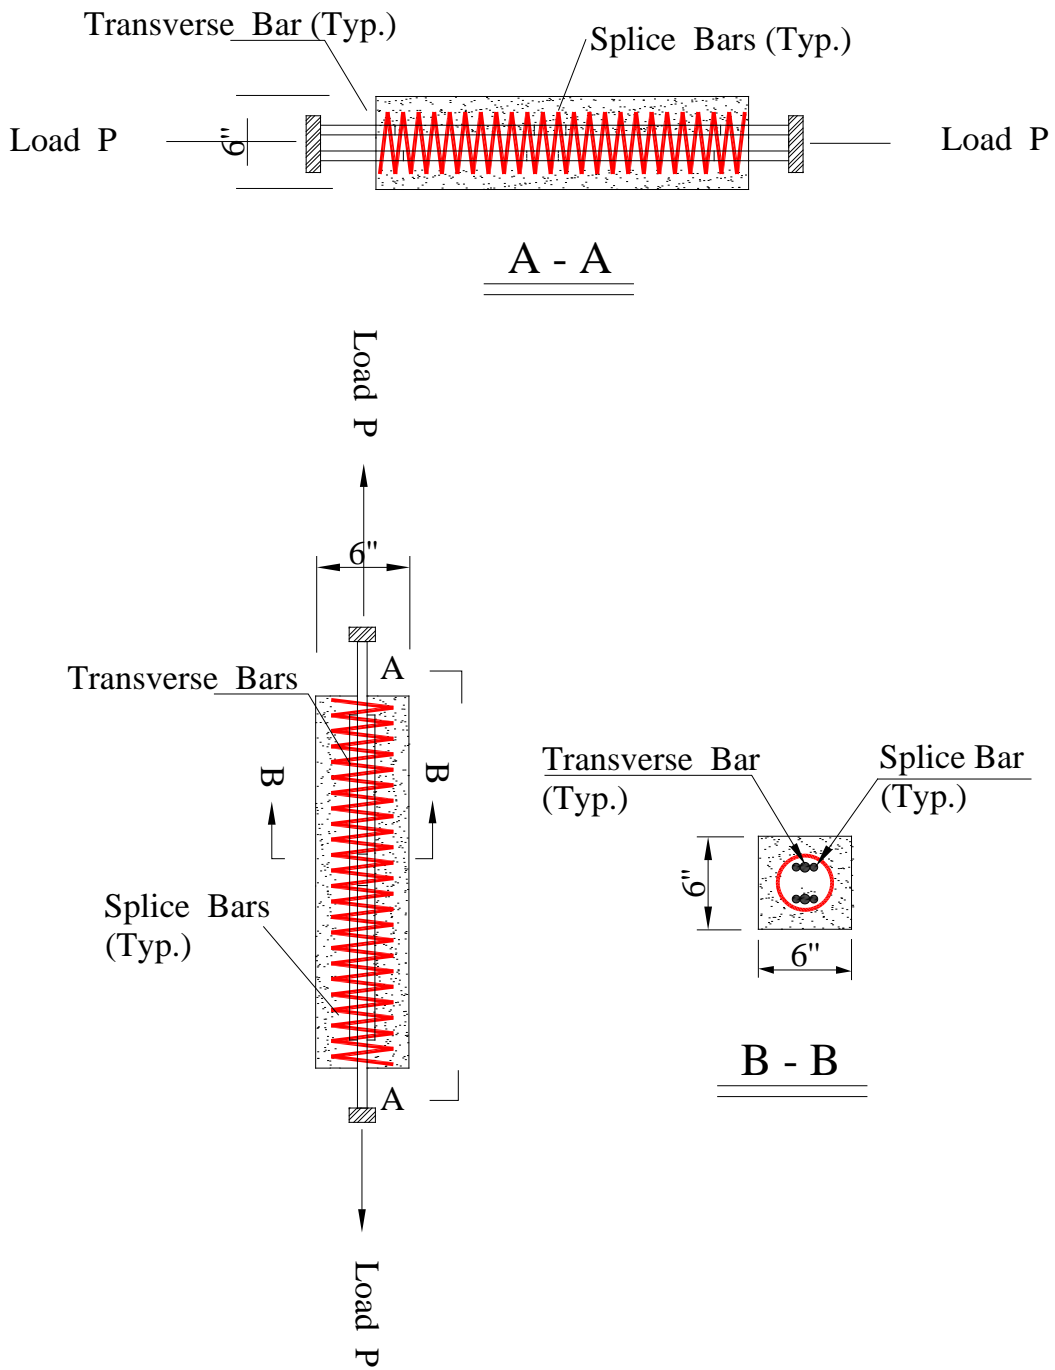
Single Joint Tension Test – Splice Bar Detail
